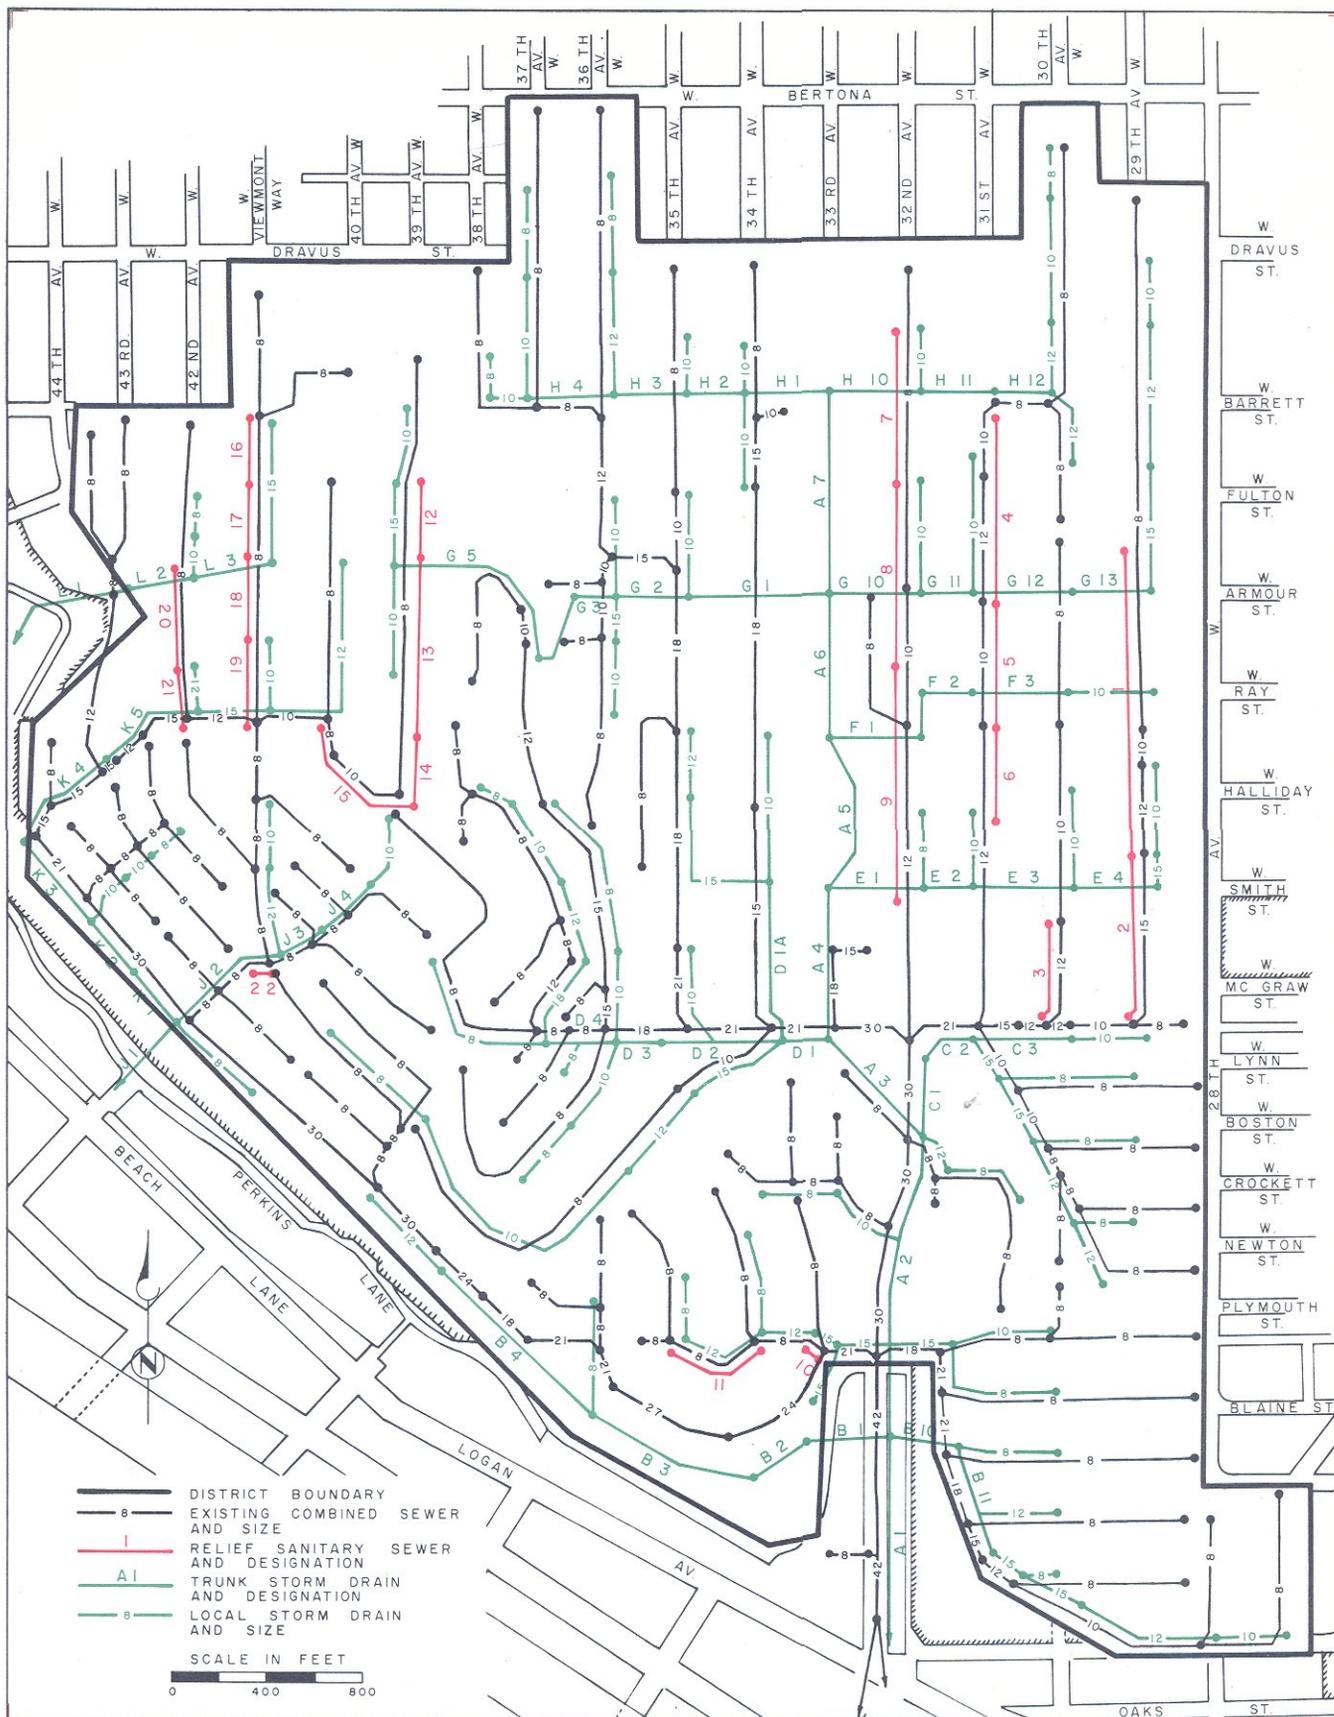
Layout of Facilities Plan II, Complete Separation, Alternative 1, District 29 - South Magnolia
